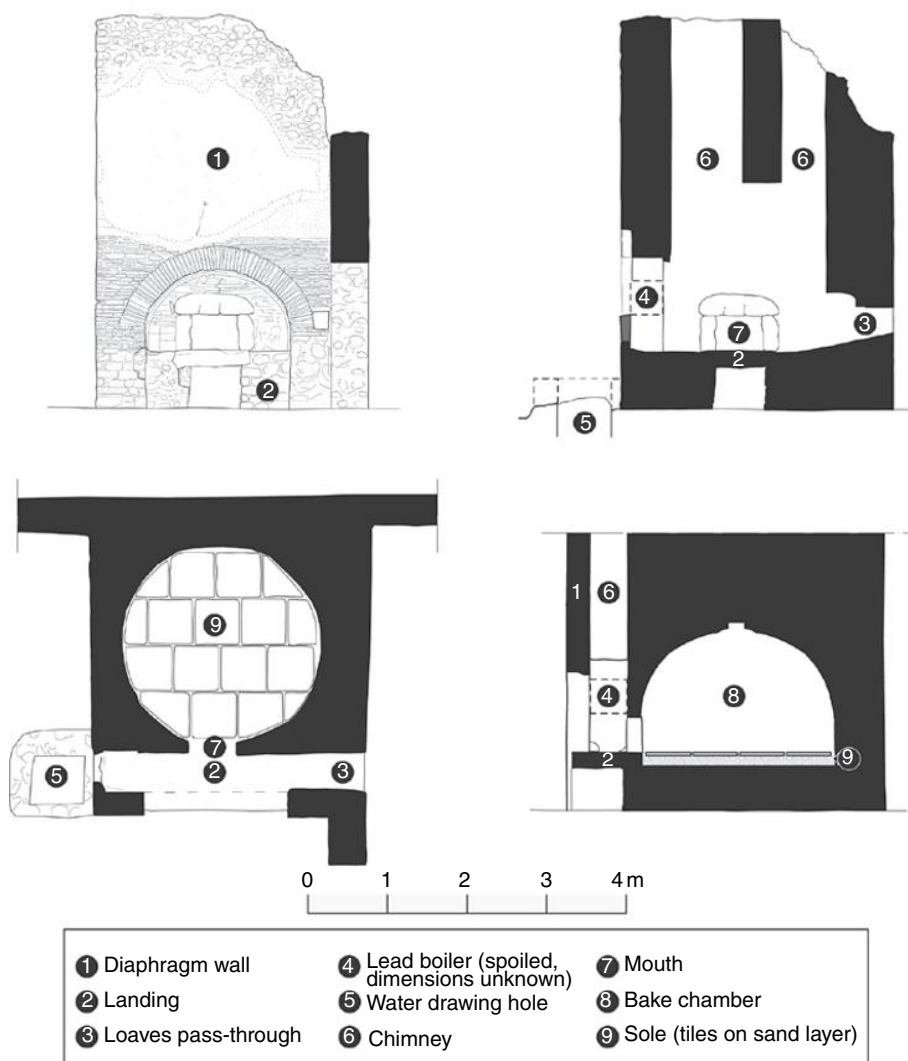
Sketch of a masonry bread oven. Drawing © Nicolas Monteix.
